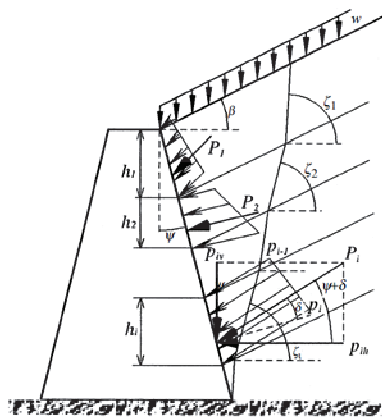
Schematic Diagram of Earth Pressure Acting on Retaining Wall
